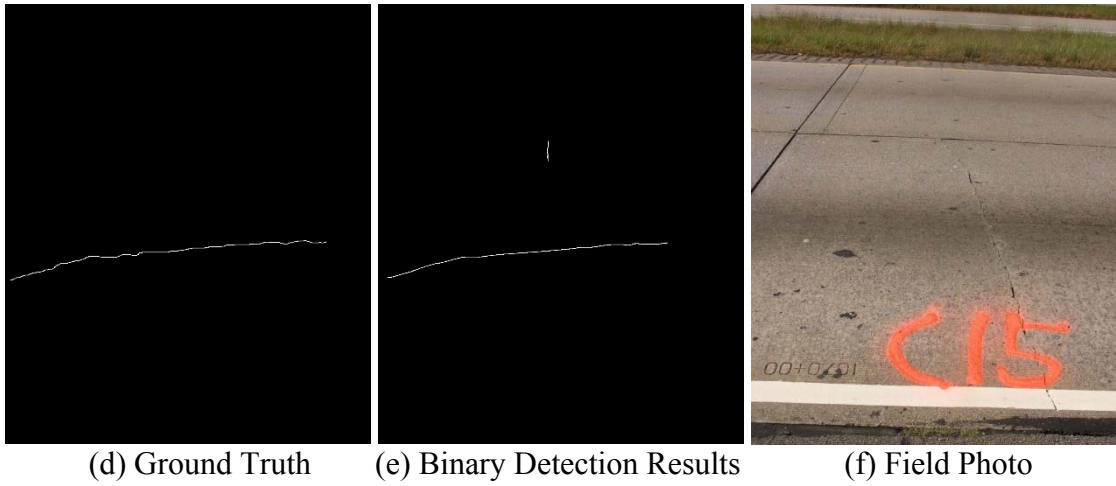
Crack detection on Slab #C15 on I-16 test site (Score: 90.4512)
